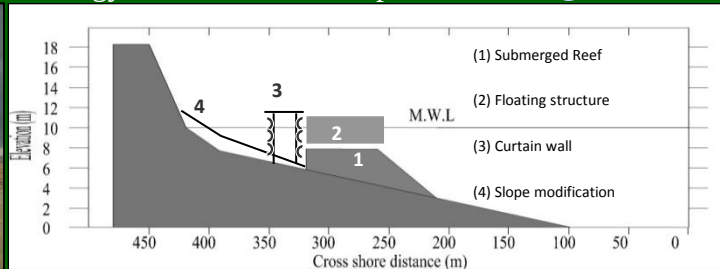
Cross section of the sloped beach with the proposed structures at Sporting.
